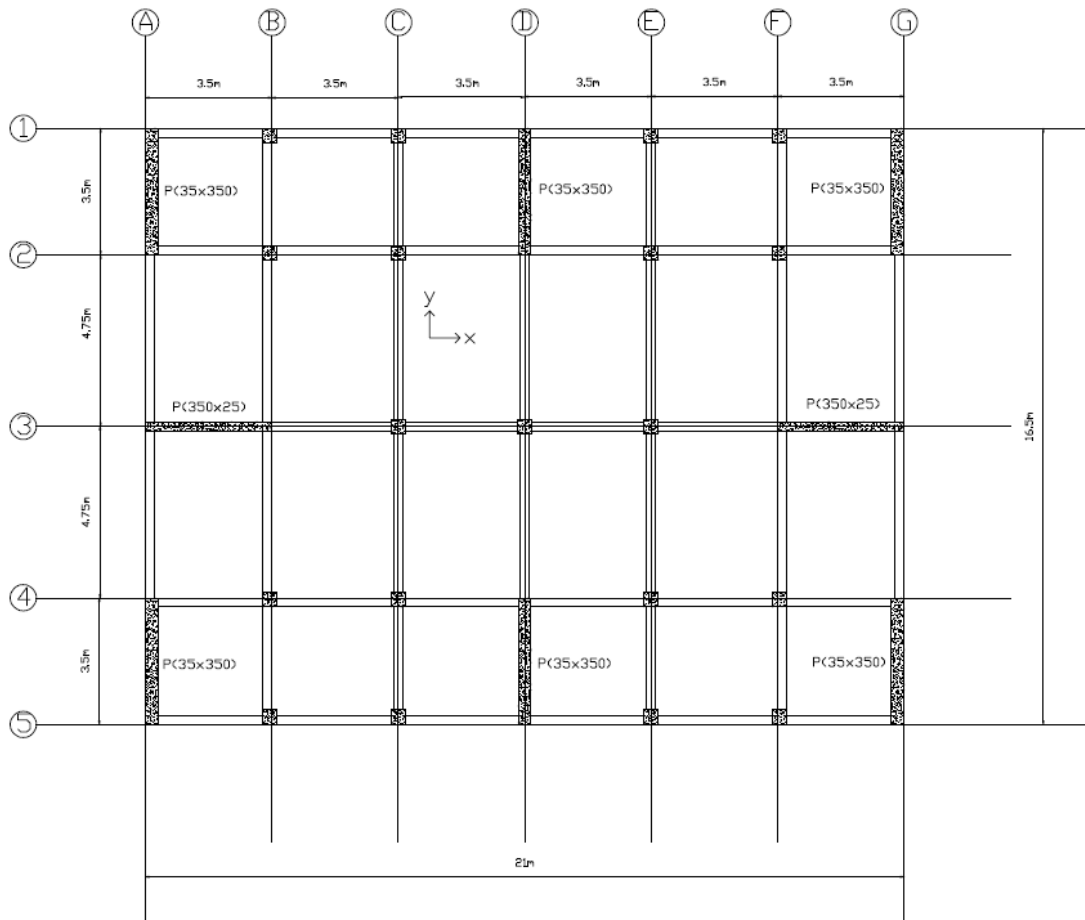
Plan of Model 7 with Wall Area to Floor Area Ratio of 0.5% in X-direction and 2.0% in Y-direction
